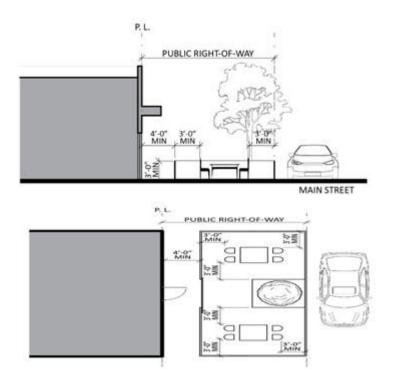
Example of an outdoor dining area in the public right-of-way with a barrier.
